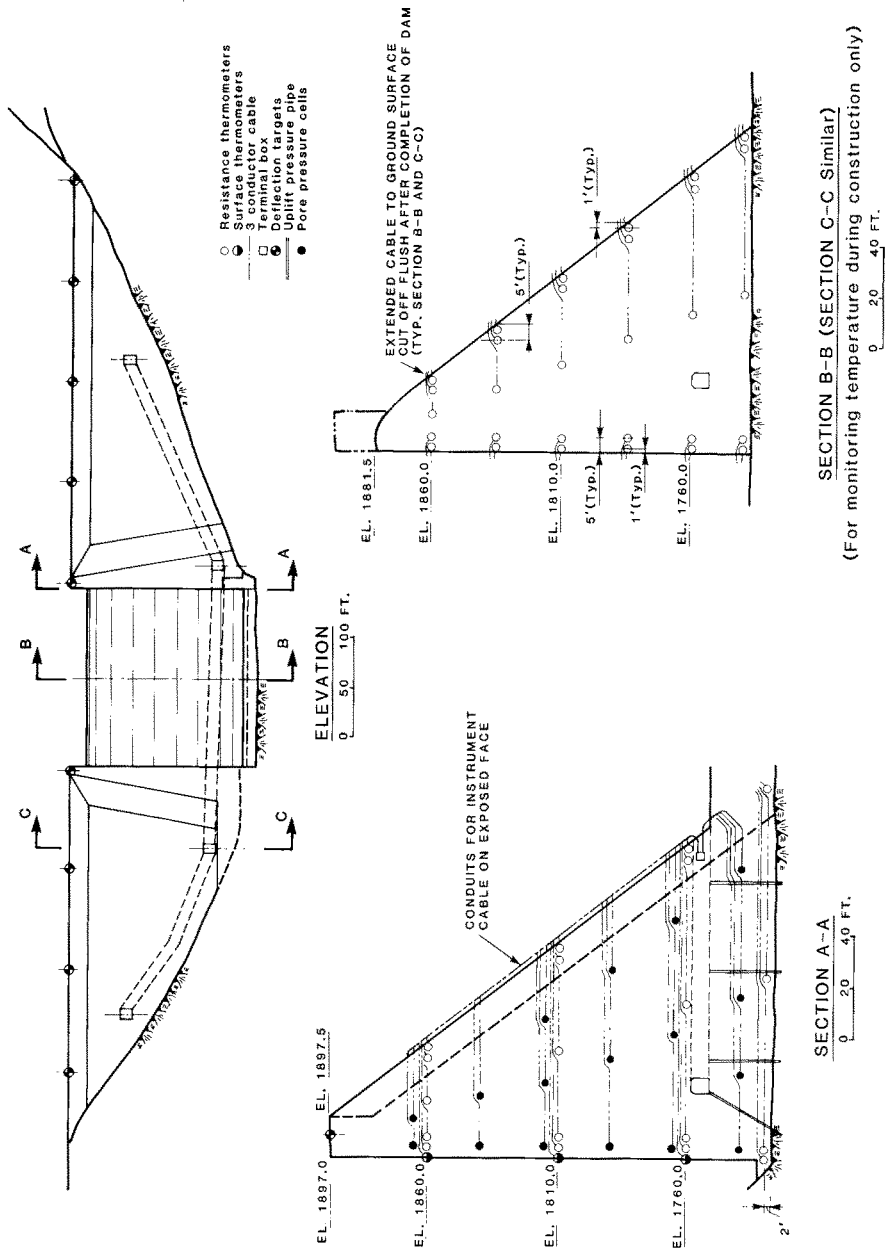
Gatesville Dam. (Roller Compacted Concrete Structure)
